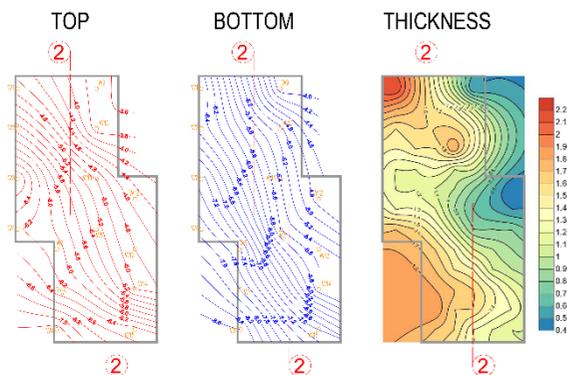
Range of remaining organic soils confirmed after dredging - P2 foundation
